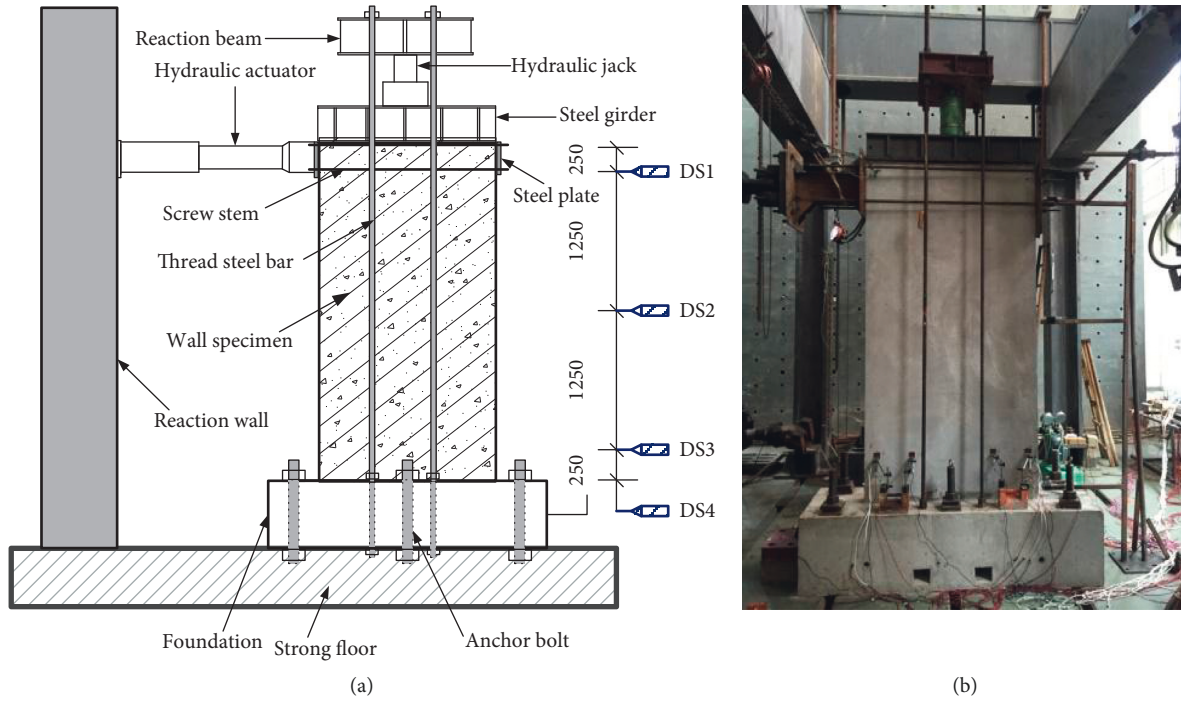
The details of test setup (unit: mm): (a) test setup of the specimen and (b) test picture.
